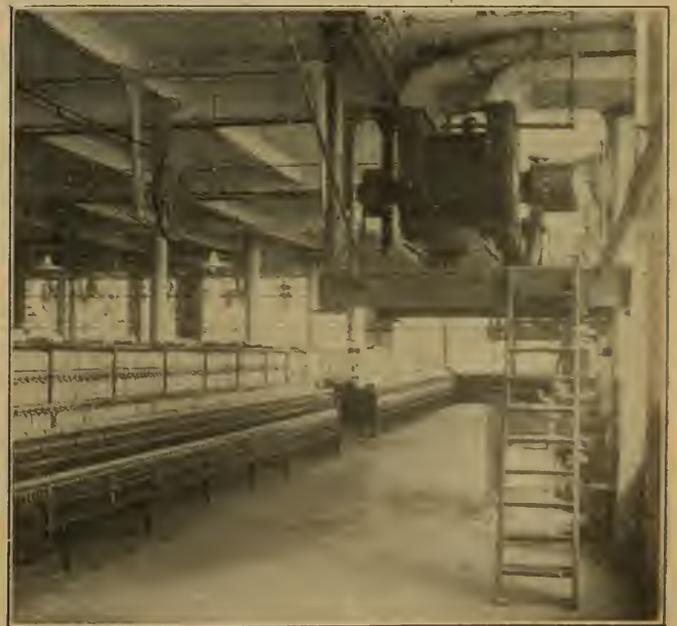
A VIEW SHOWING ARRANGEMENT OF VENTILATING DUCTS.
